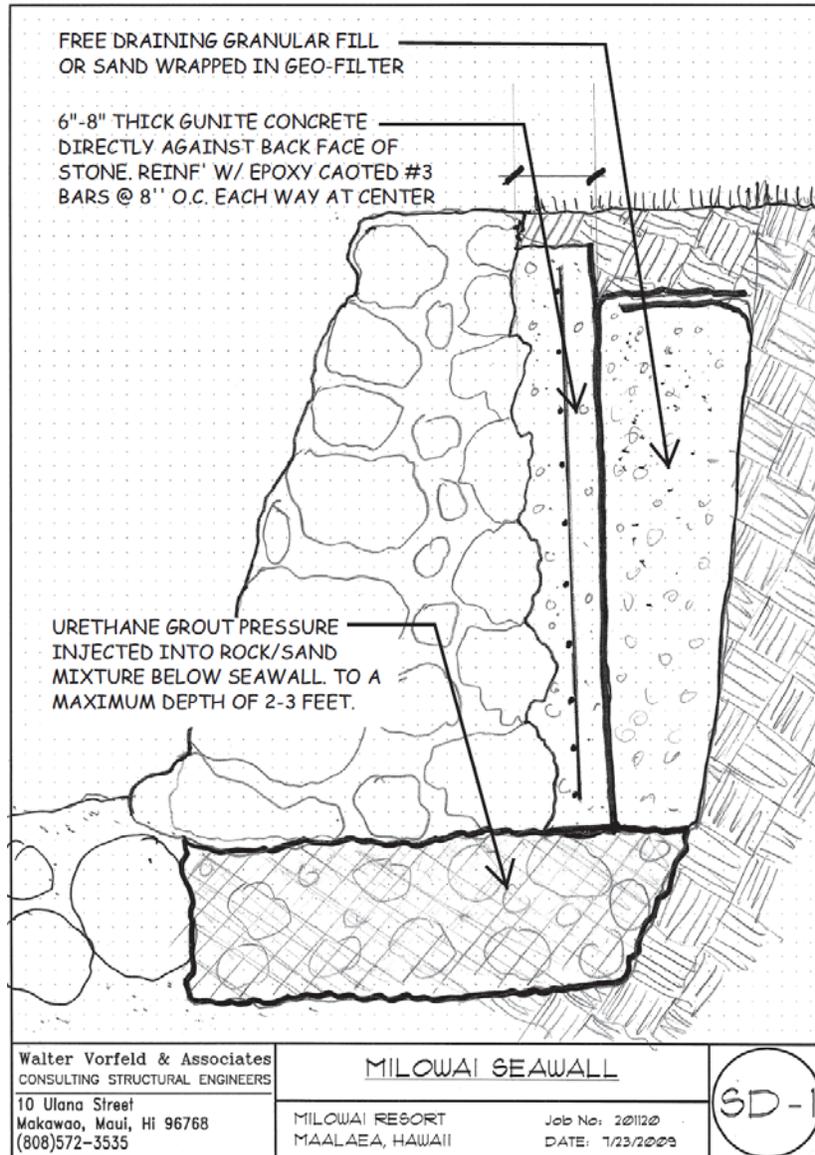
Wall repair schematic by Walter Vorfeld & Associates
